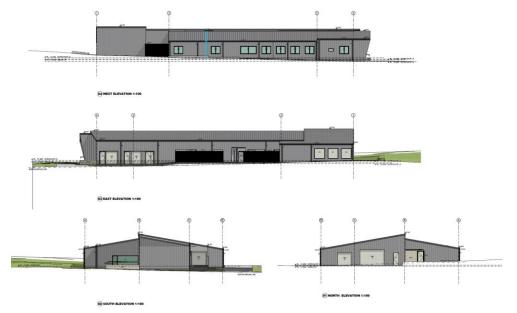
TAM elevations (Fortey + Grant Architecture)
